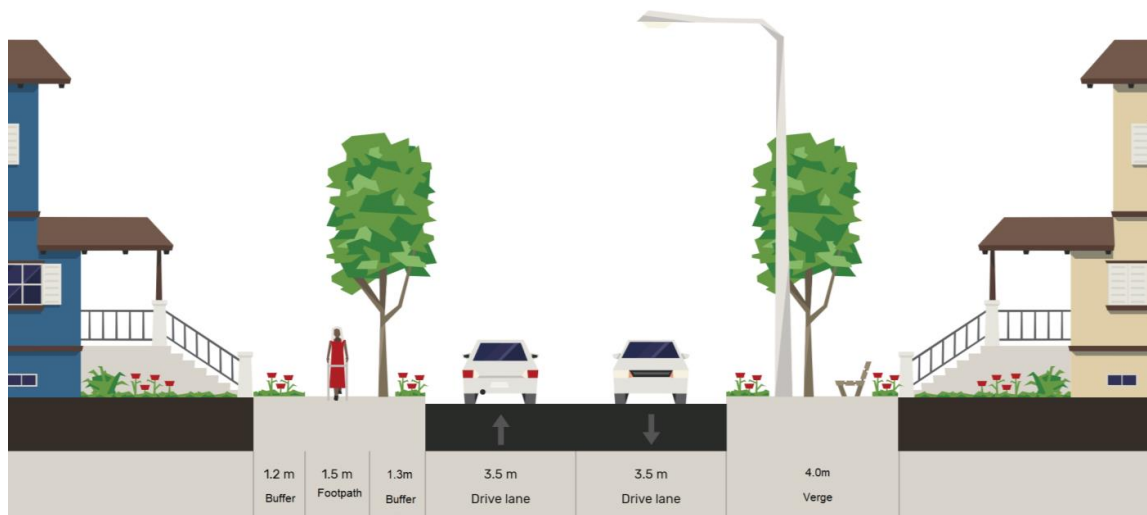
Indicative subdivision street cross section (15m wide reserves)
